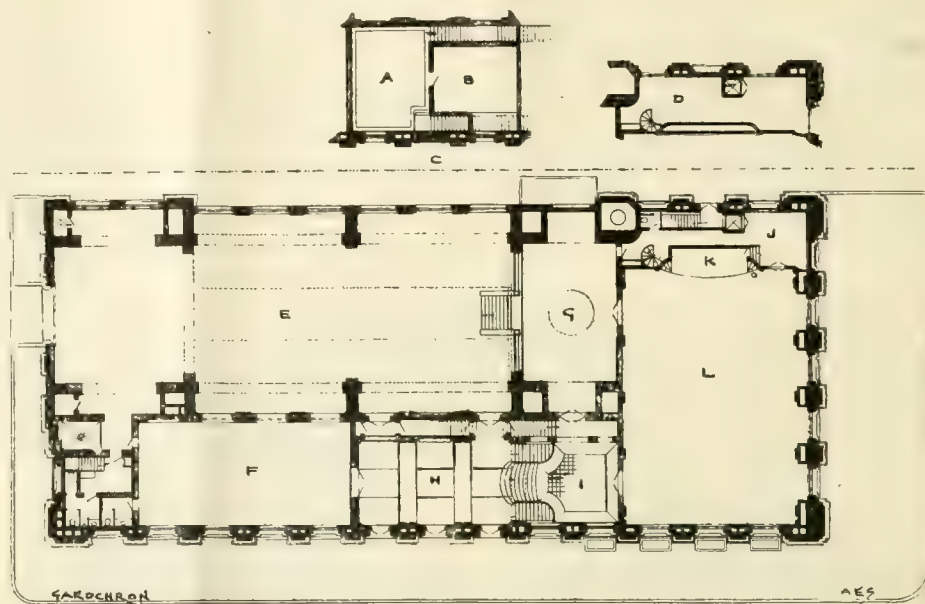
BOSTON HORTICULTURAL HALL: FIRST-FLOOR PLAN. (SEE P. 95.)
